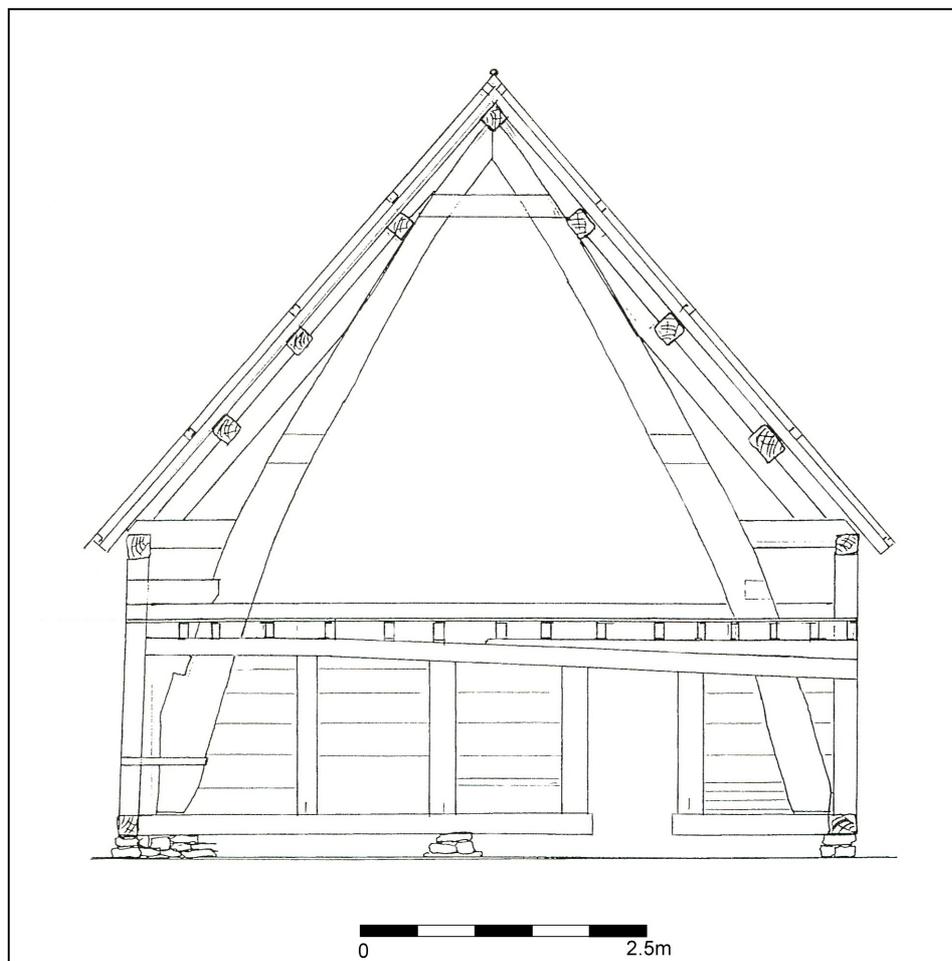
View N showing open cruck truss (originally collared) with wooden partition wall resting on stone plinth
